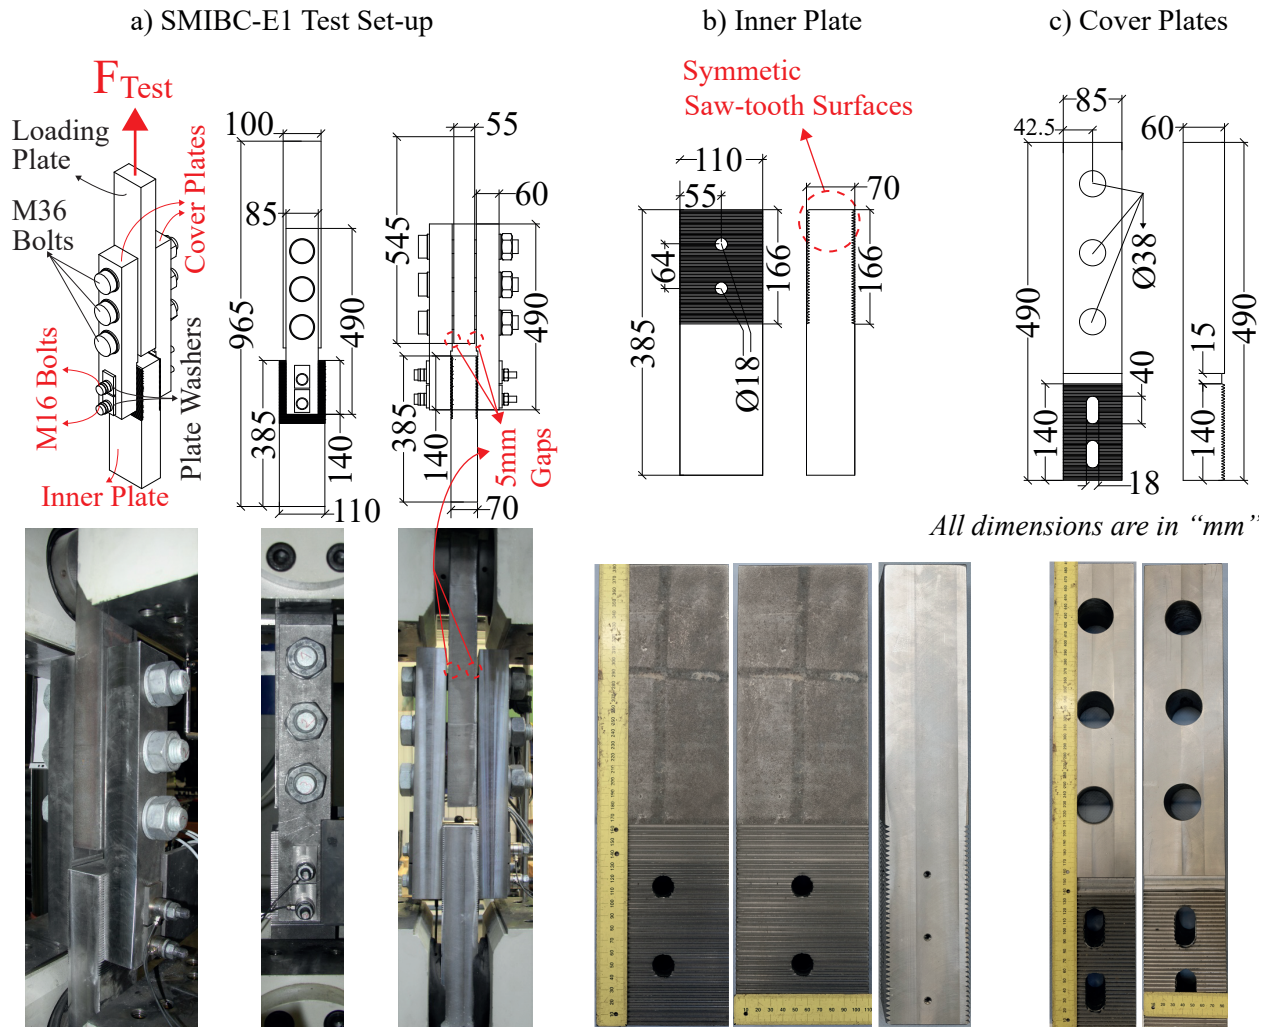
SMIBC-E1 test set-up and the technical drawings of the main set-up components.
